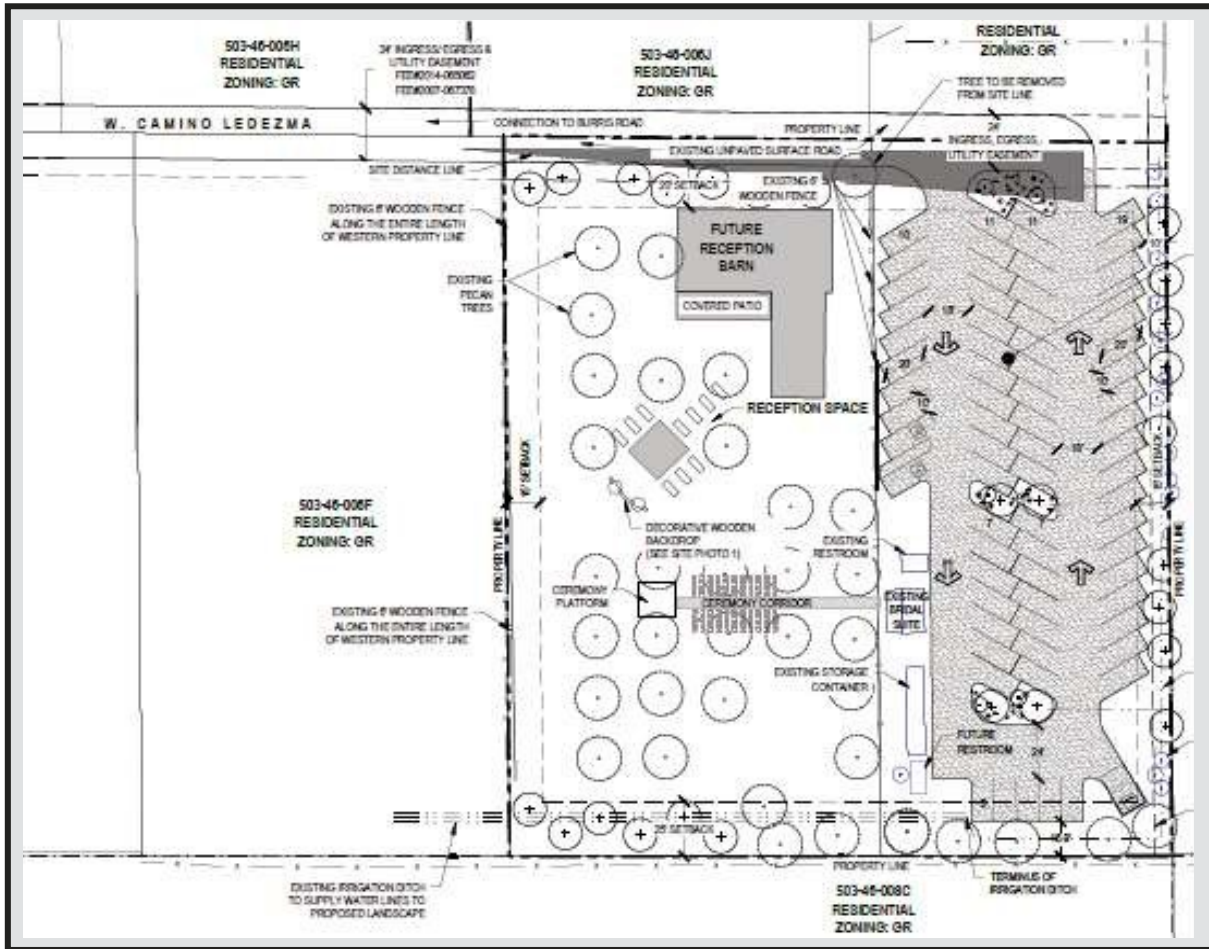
Hernandez Pecan Farm Site Plan with Parking Area
